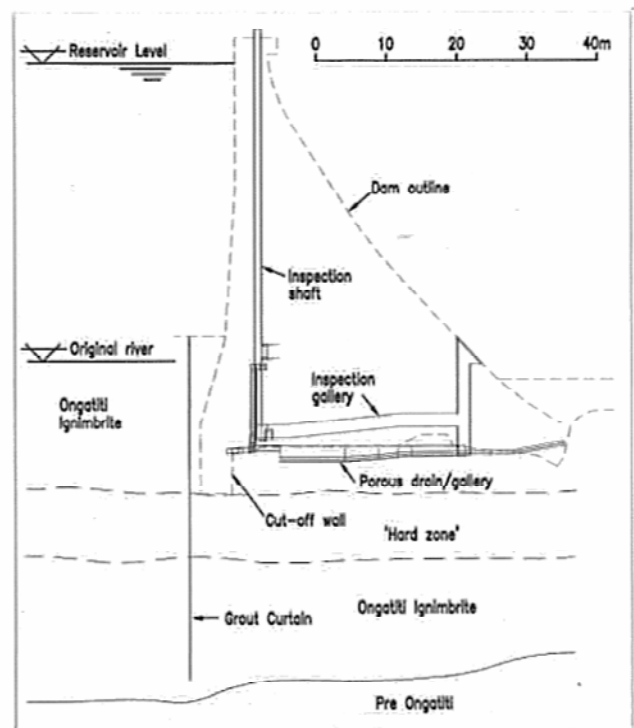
Cross Section of Arapuni Dam (Note the spatial separation of the grout curtain from the dam)
